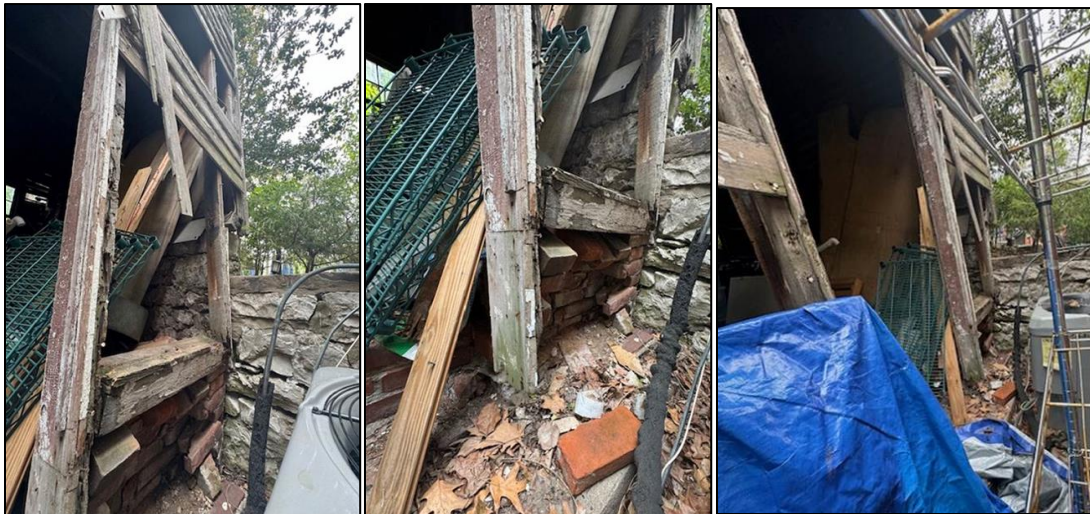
Photo examples of outbuilding entryway (east elevation) in deteriorated state.
